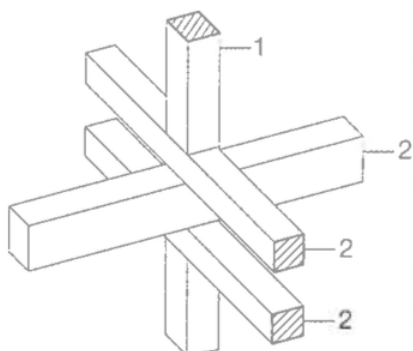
Frame connection (1 column, 2 beam)⁸⁹
